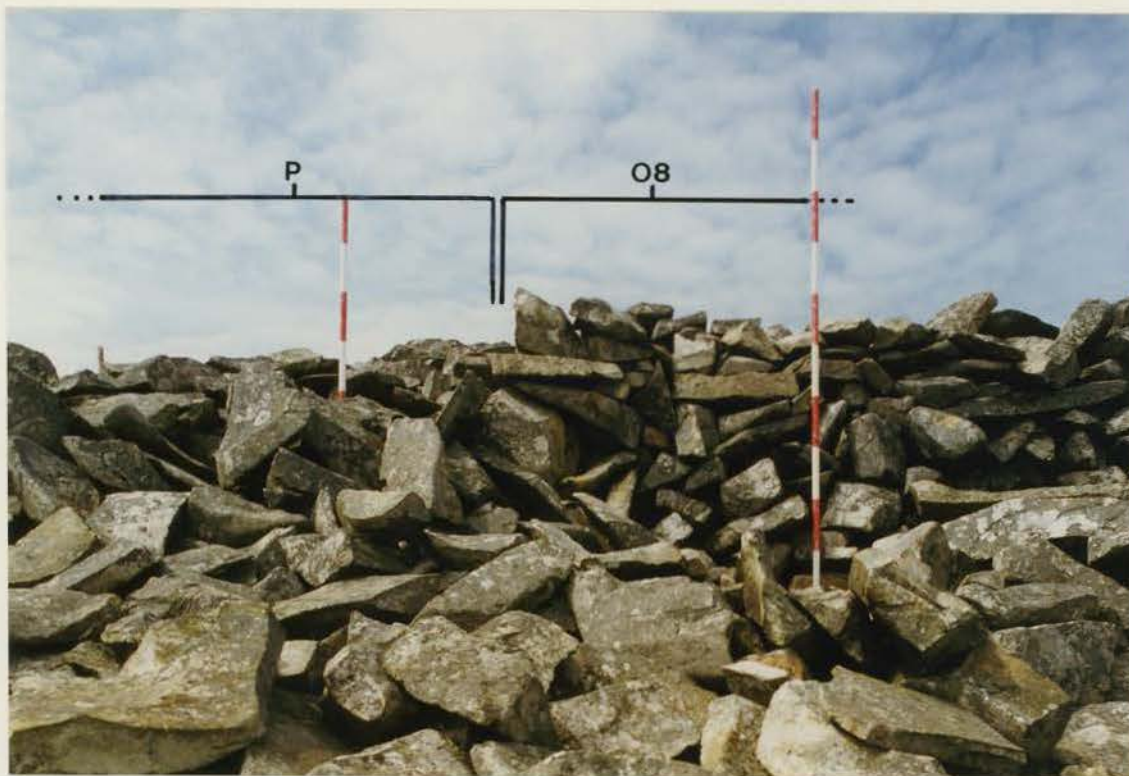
G1022/176/01 ; Collapse O8 before conservation showing modern rebuild.
